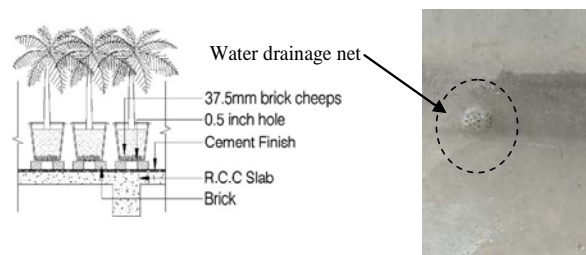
Section of pot plants arrangement (Left) and net on water drainage pipe (Right)
